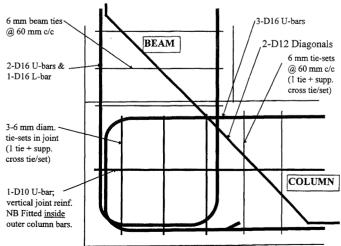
Knee Joint 9 with unequal top and bottom beam bars plus two extra diagonal bars
